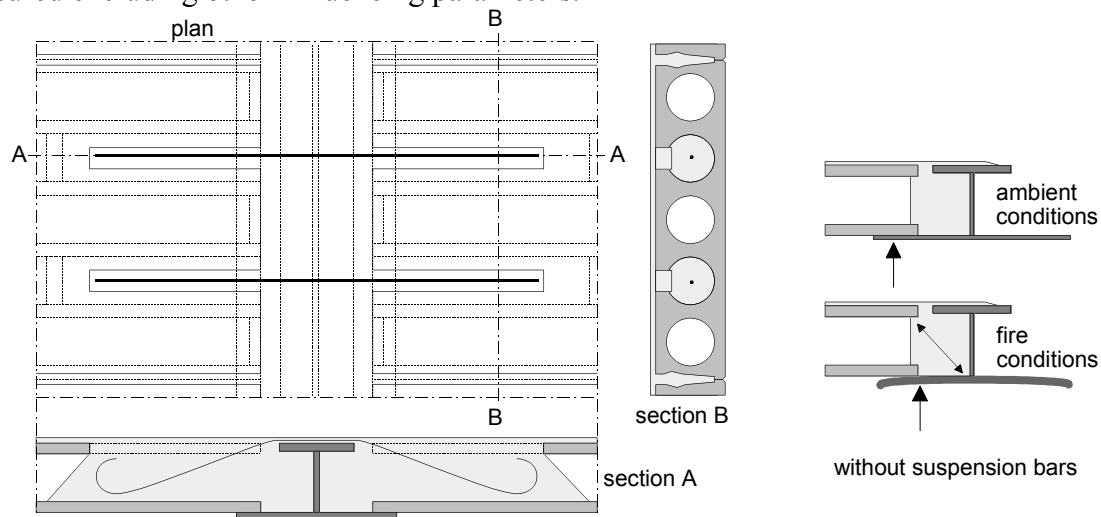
Detail (left) of HC slab supported on integrated steel beam using suspension reinforcement cast in two cores filled in cast-in-place concrete. Shift of the support reaction (right) due to bending of the supporting steel flange.
